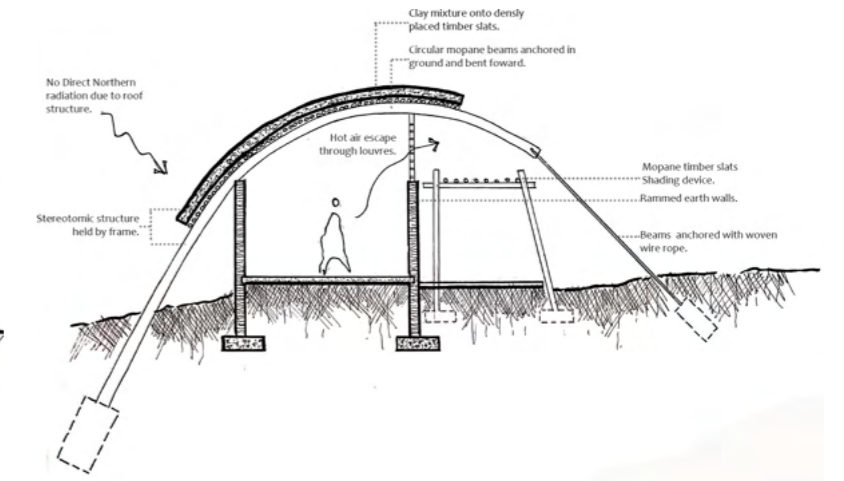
Tourist Pavilion roof exploration sketch (Author, 2021)
